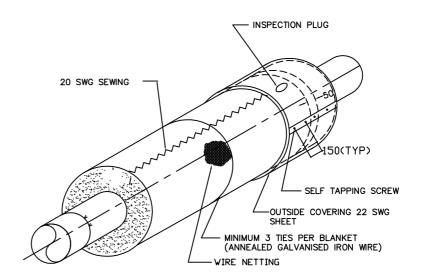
SINGLE LAYER INSULATION FOR PIPING
